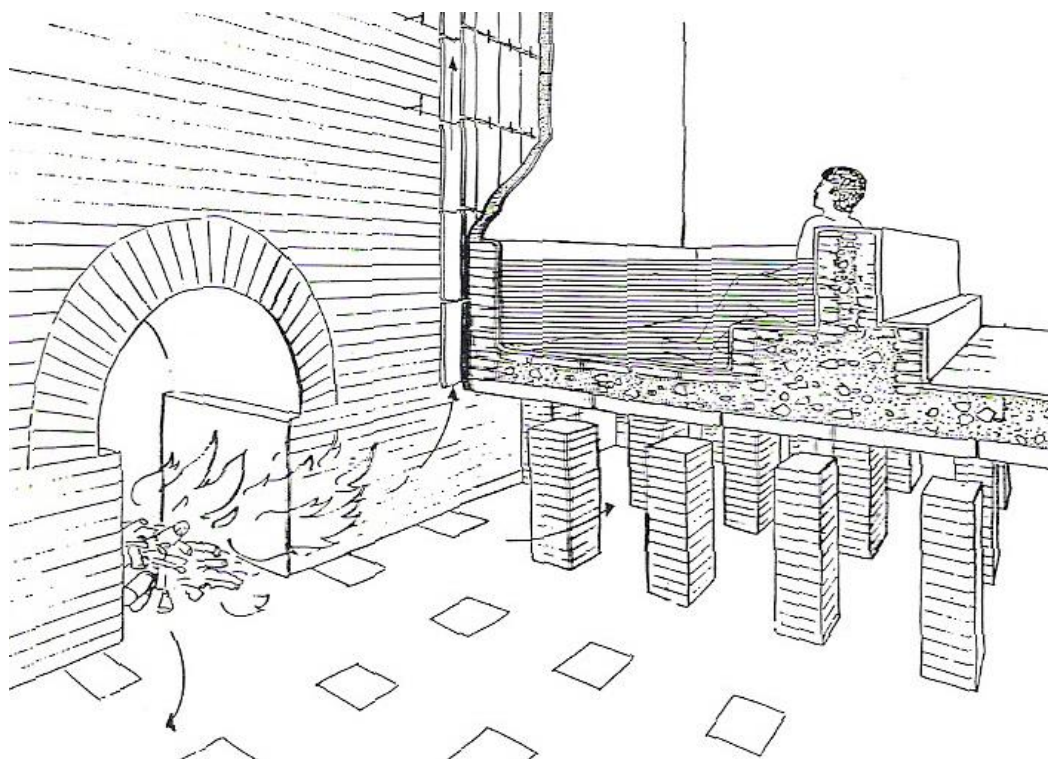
Drawing showing Heat Circulating in Hypocaust and through Walls (Shepard 1987)
